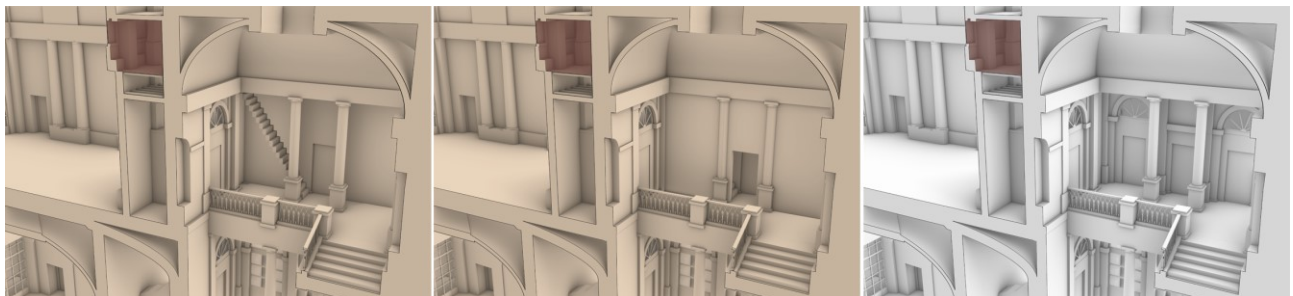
The Poccianti's staircase on the second floor. The incomplete orchestra room is highlighted in red. On the left is a reconstruction of the staircase that led to the orchestra room; in the center is a reconstruction of what the lobby should look like according to Poccianti's project; on the right is the current state.
